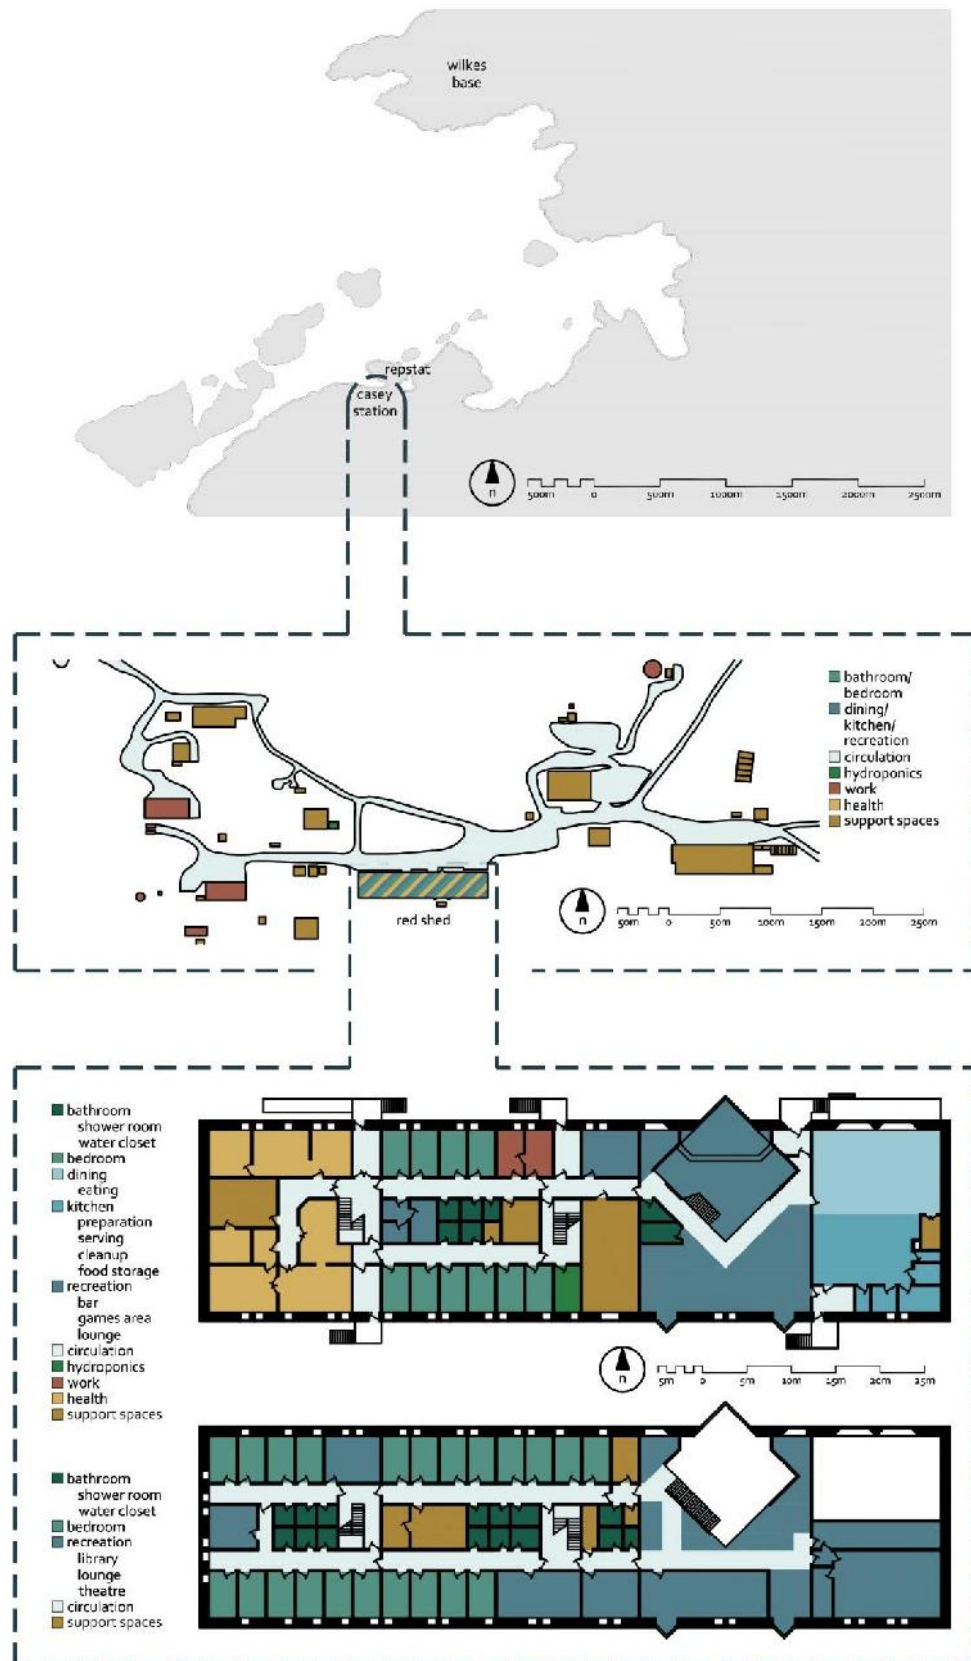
Casey Station's Red Shed – Site, Orientation, Floor Plan²⁵⁶
